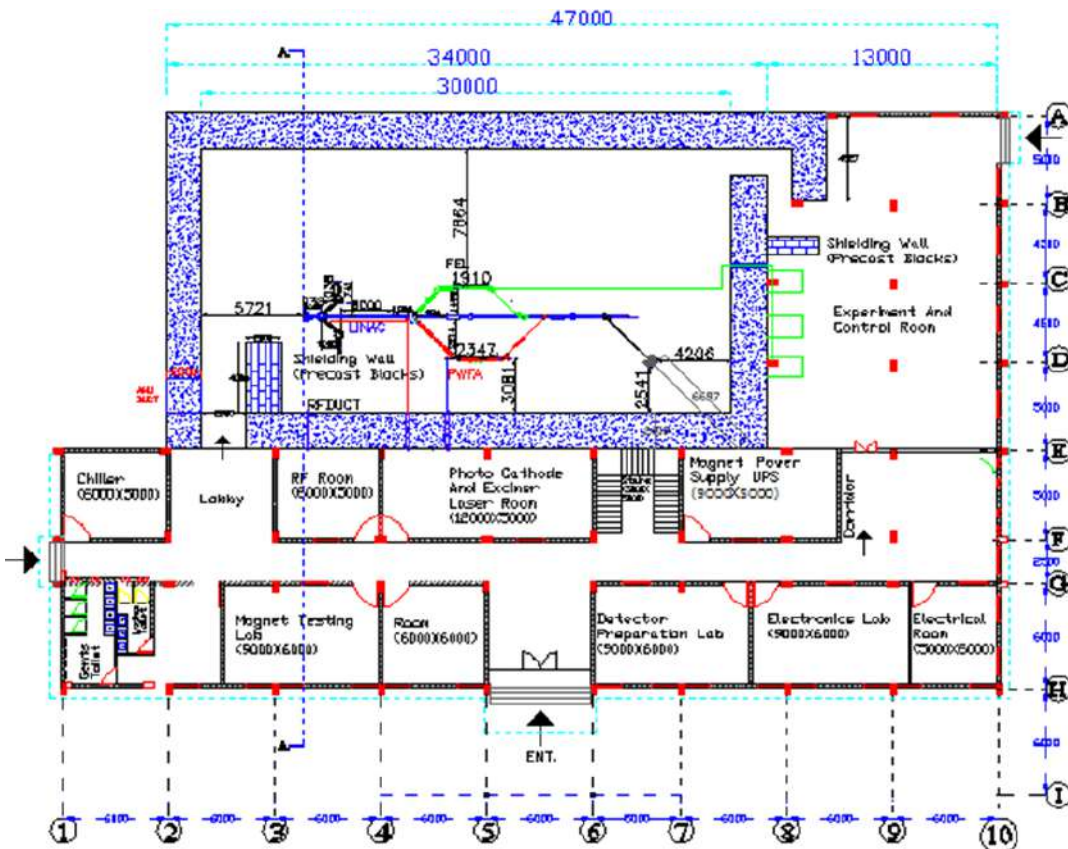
IPR LINAC building layout as it is planned now for ground floor
